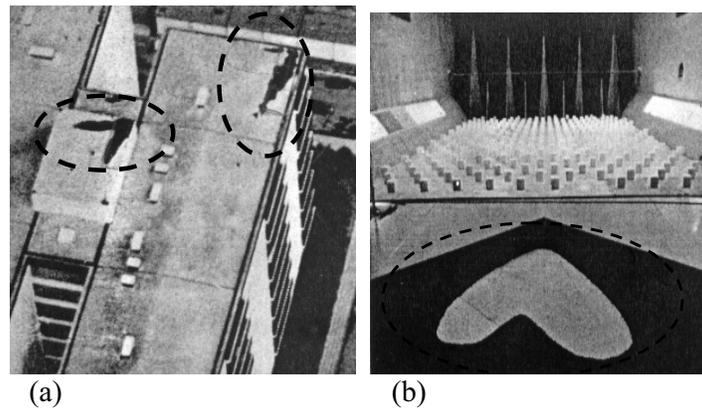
(a) Roof ballast scour on a high-rise building; (b) Wind tunnel study of parapet effects on roof gravel scouring (both from Kind and Wardlaw 1984)
